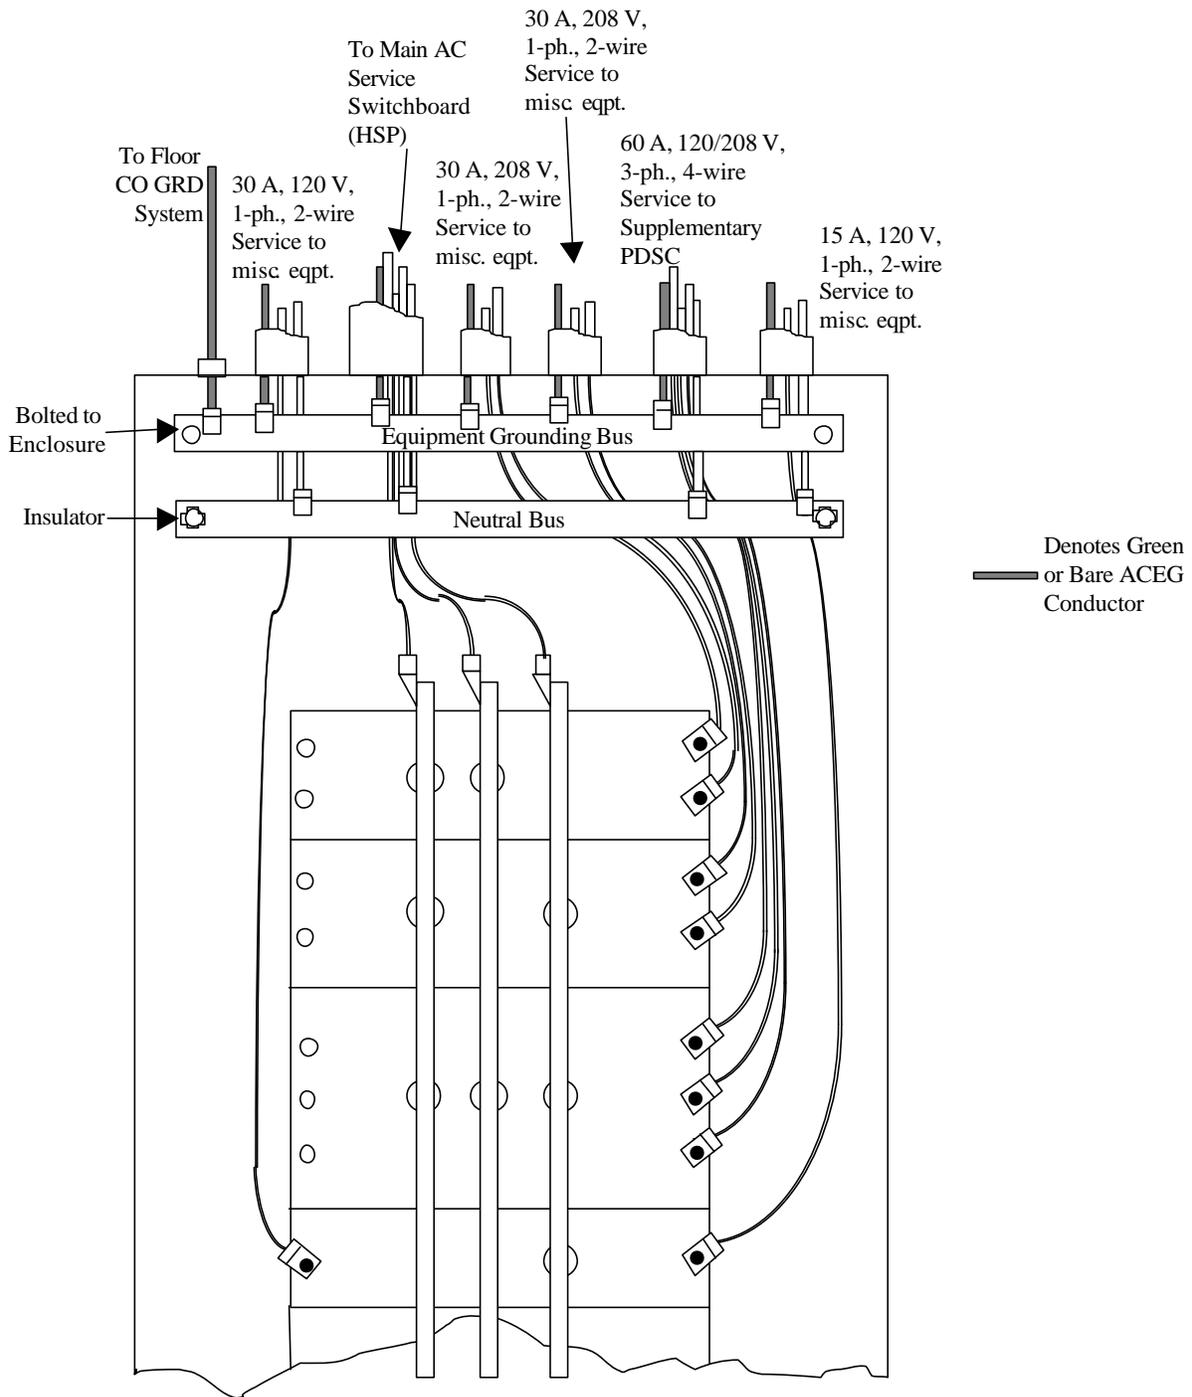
Typical Power Distribution Cabinet Equipment Grounding Arrangement
